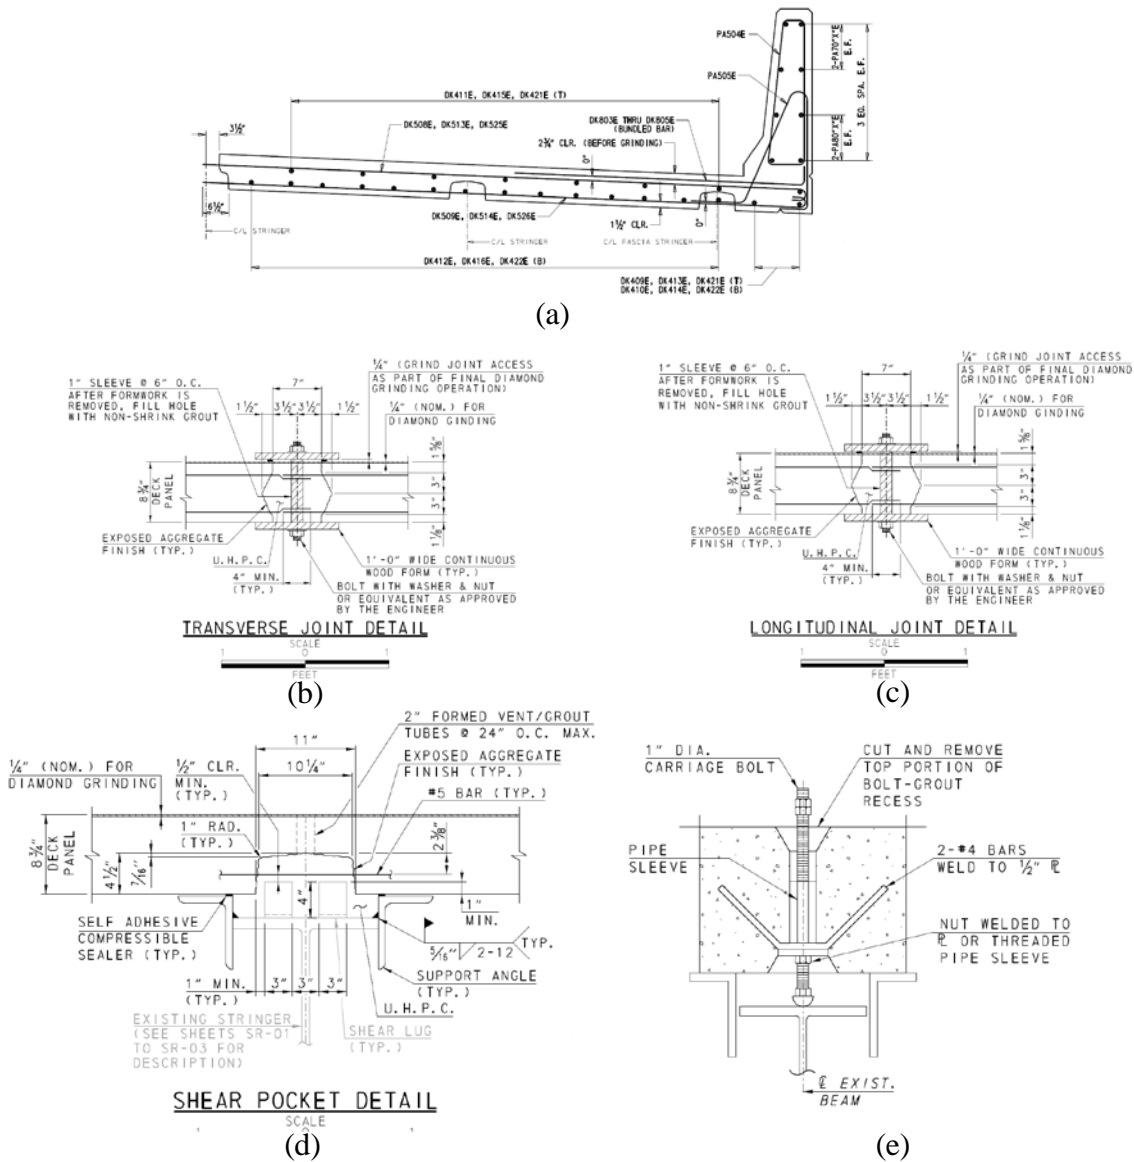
Typical FDPC deck panel details for Delaware: (a) FDPC deck detail, (b) transverse joint detail, (c) longitudinal joint detail, (d) shear pocket detail, and (e) leveling bolt detail
